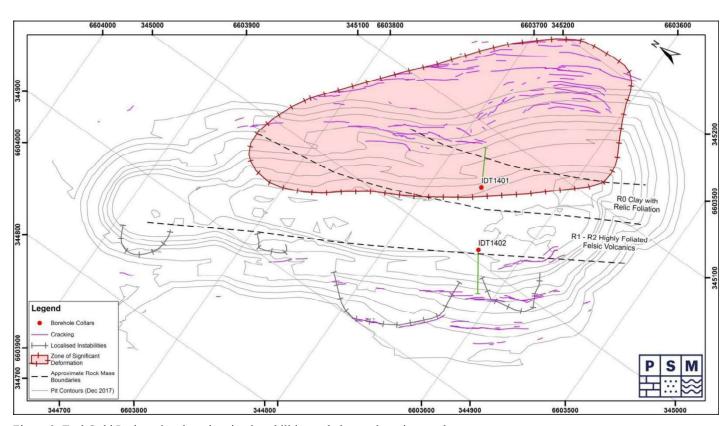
Teal Gold Project site plan, showing instabilities and observed tension cracks.
